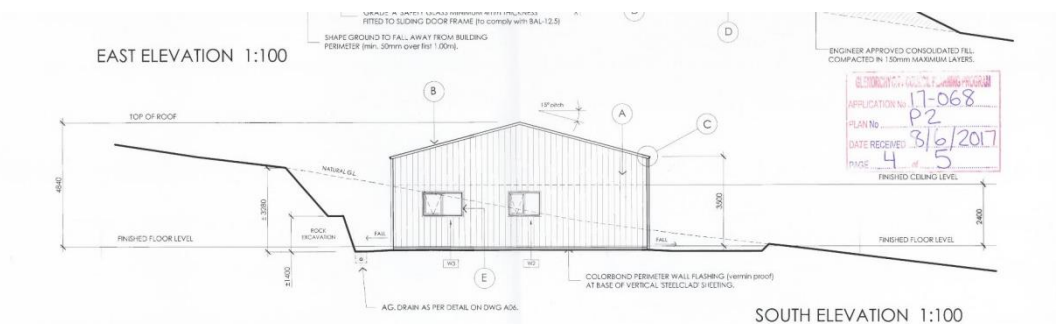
South Elevation of 66 Toffolis Road, Claremont.
